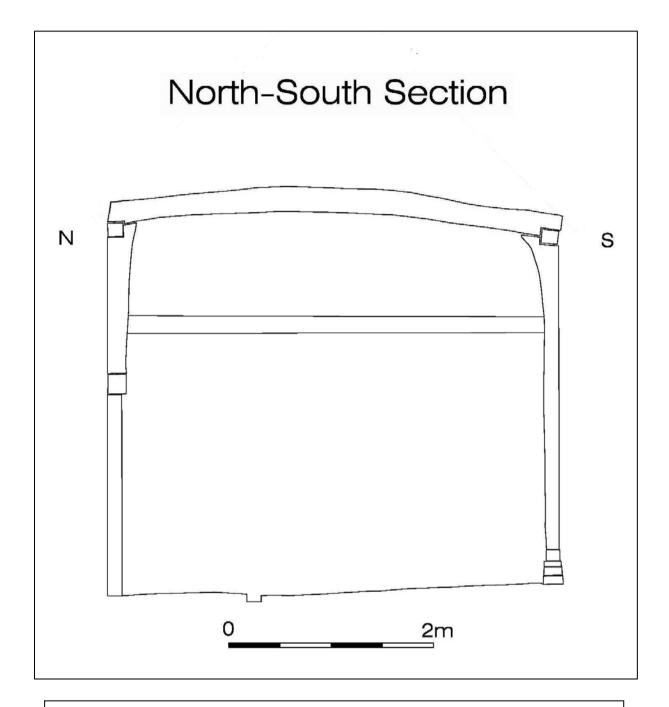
Crown View, Horsted Keynes: Section through Stable building showing the central truss and posts
